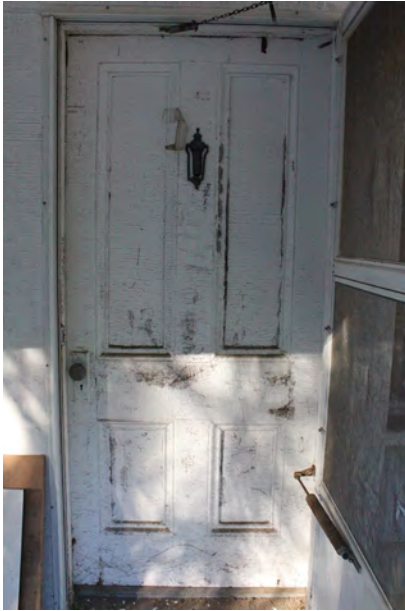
Four-paneled wood front entry door to 19th century section with wide Greek Revival sticking profiles. (HA, 2015)
